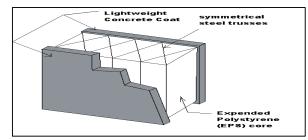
Precast Concrete Sandwich Panel (PCSP)
